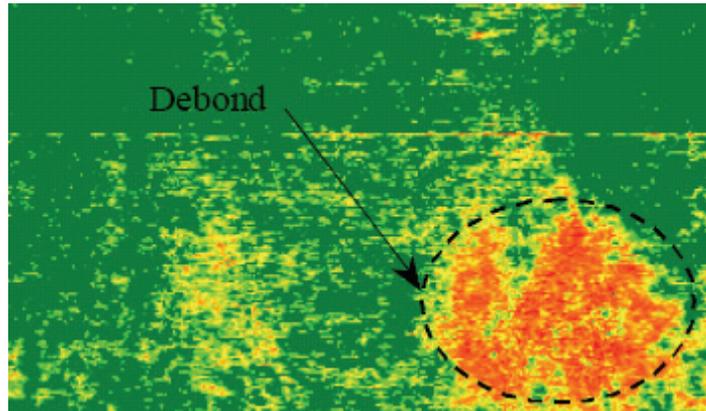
C-Scan Image of an FRP/Concrete Sample showing a Debond between the FRP and Concrete
